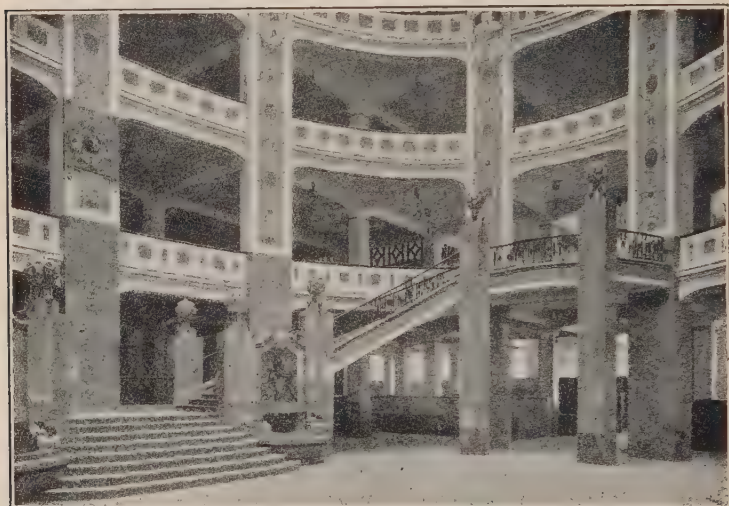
CENTRAL ARCADE OF THE REINFORCED CONCRETE BUILDING,
